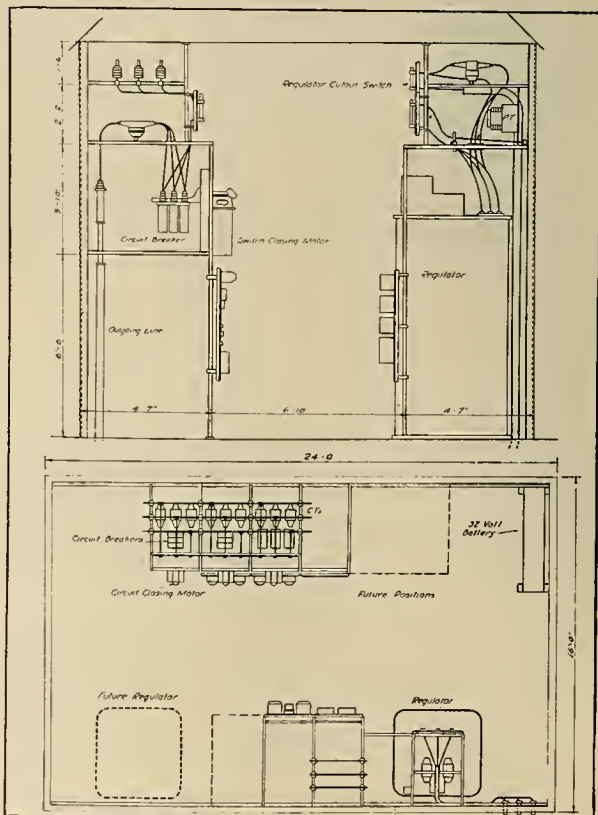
Below—Plan of indoor equipment. Above—Section through indoor equipment.
